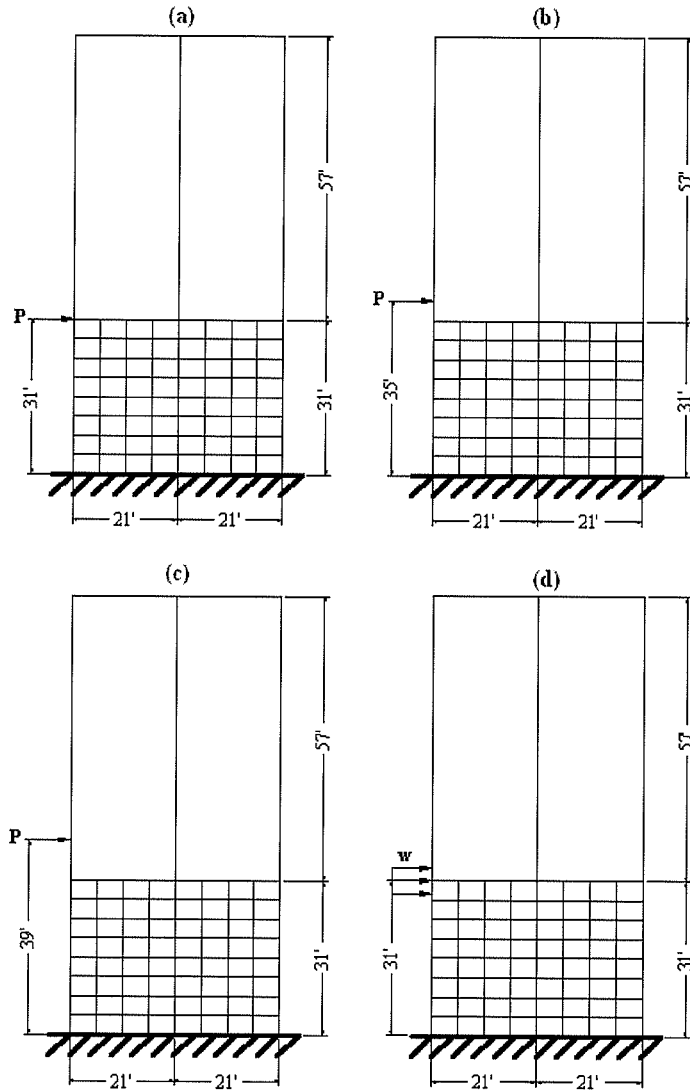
SH-87 Impact Load Locations: (a) Load Location 1: Point Load at Top of Wall, (b) Load Location 2: Point Load 48 inches Above Wall, (c) Load Location 3: Point Load 96 inches Above Wall, (d) Location 4: 60-inch Wide Distributed Load at Wall
